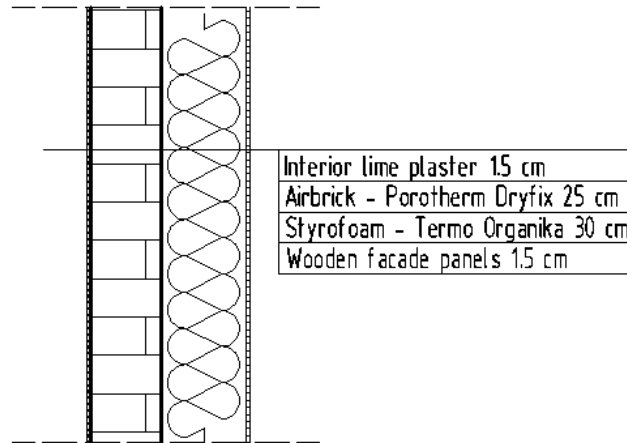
Structure of the exterior wall covered with panels.
